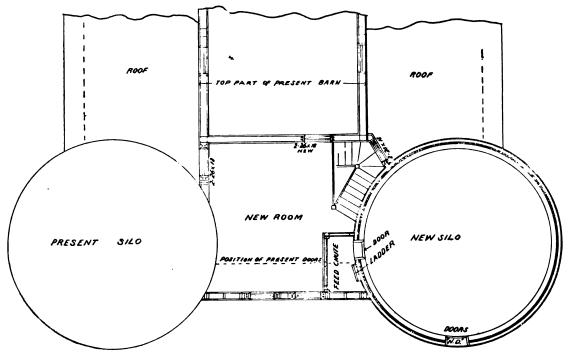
COMBINATION CEMENT SILO (UPPER PLAN).
